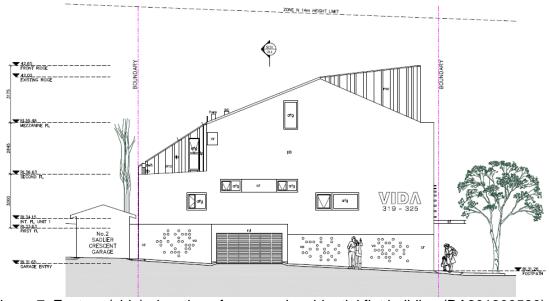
Eastern (side) elevation of approved residential flat building (DA201300590).
